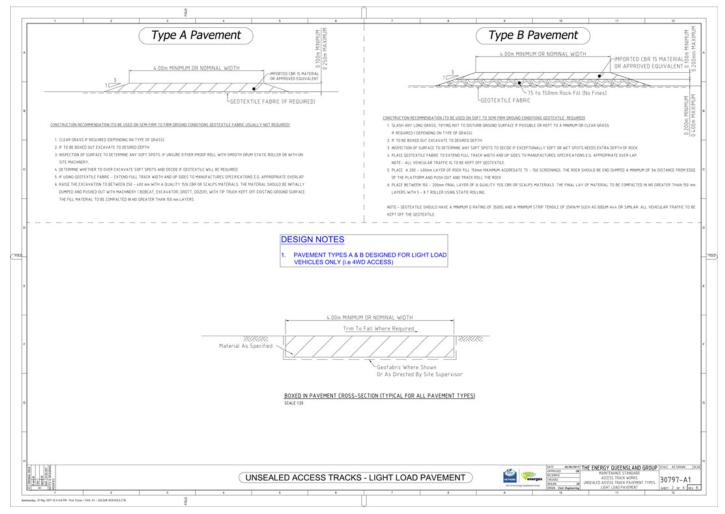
Access Track Infrastructure – Light Vehicle Loads – Access Track Pavement Types.
